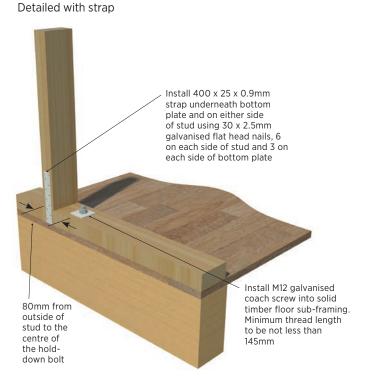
TIMBER FLOOR EXTERNAL WALL
